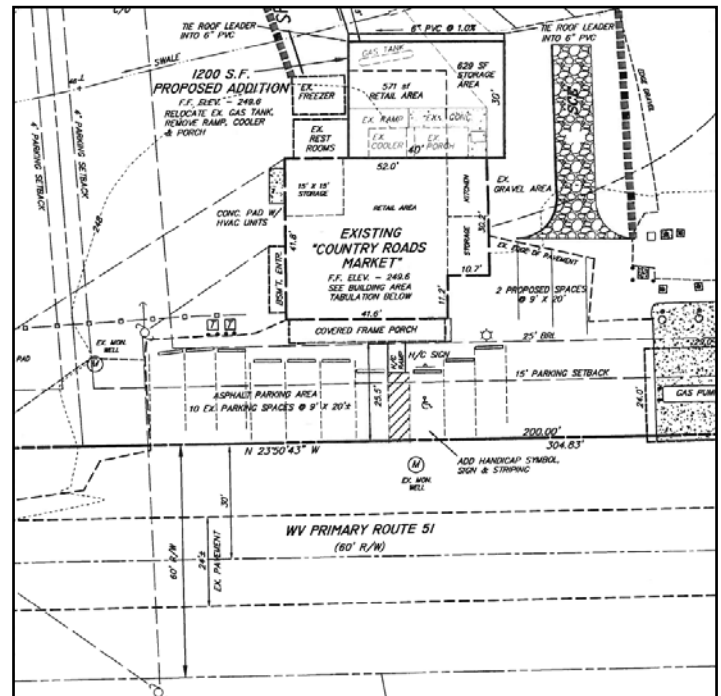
(Right): Section of the approved site plan S03-06, showing the location of existing parking adjacent to the right-of-way.
